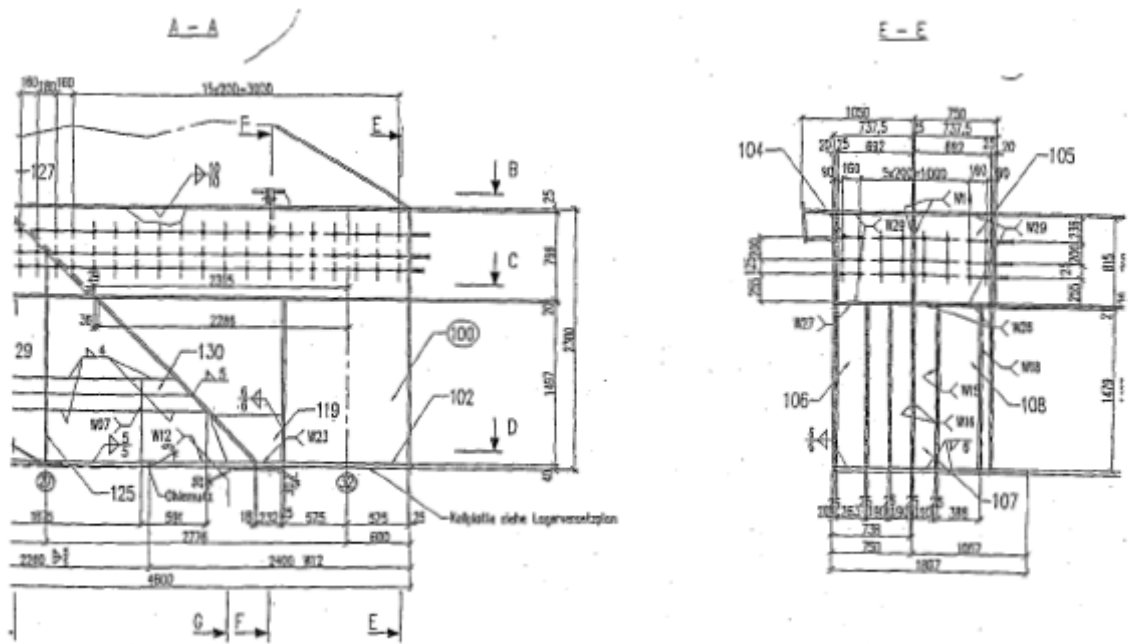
Welded connection of the arch to the main girder
